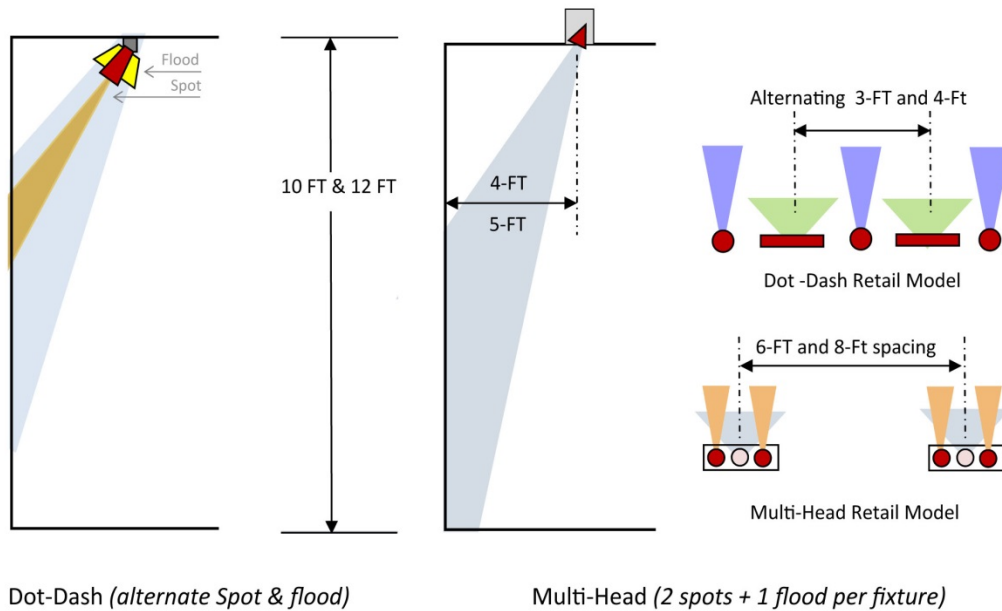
General architectural wall washing and retail sales merchandise wall washing.
